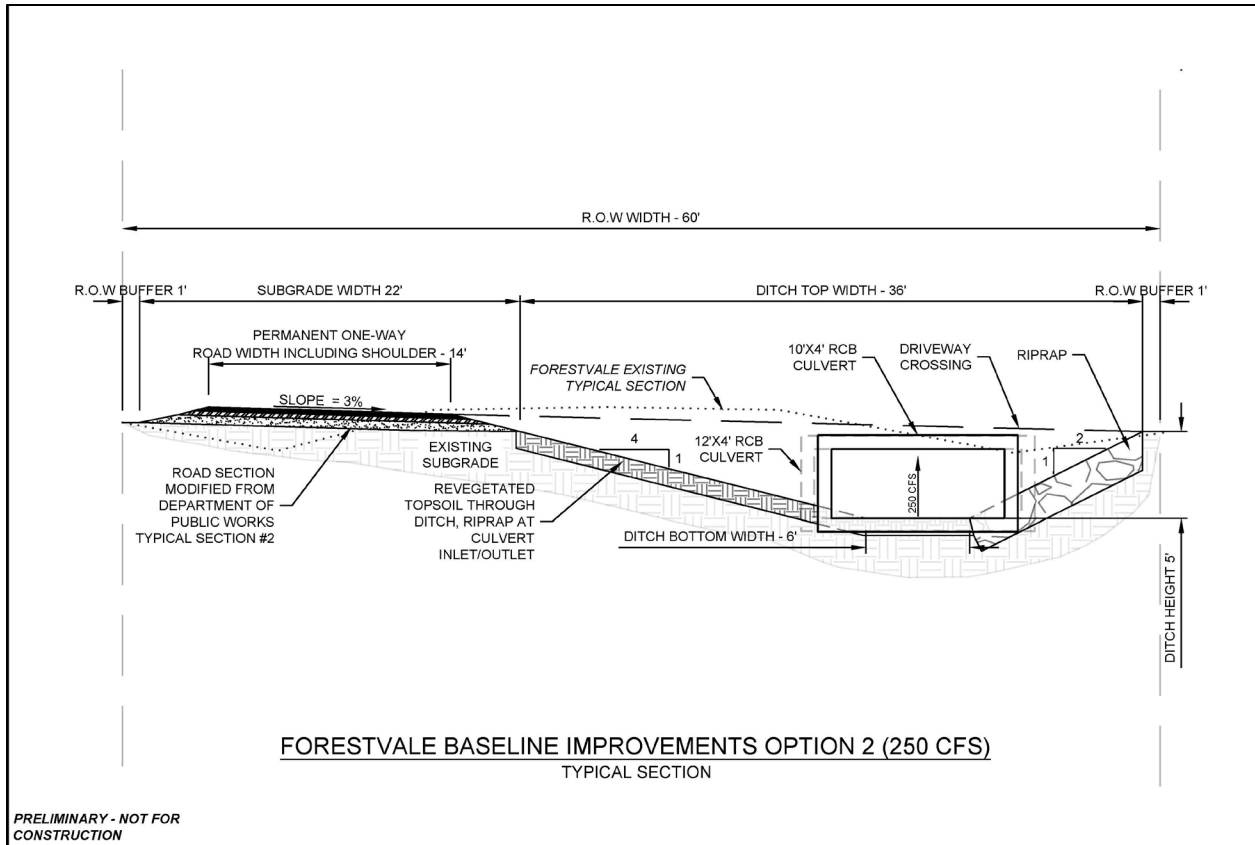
Typical section for the roadside ditch and RCB culvert layout for Forestvale Baseline Improvements Option 2.
